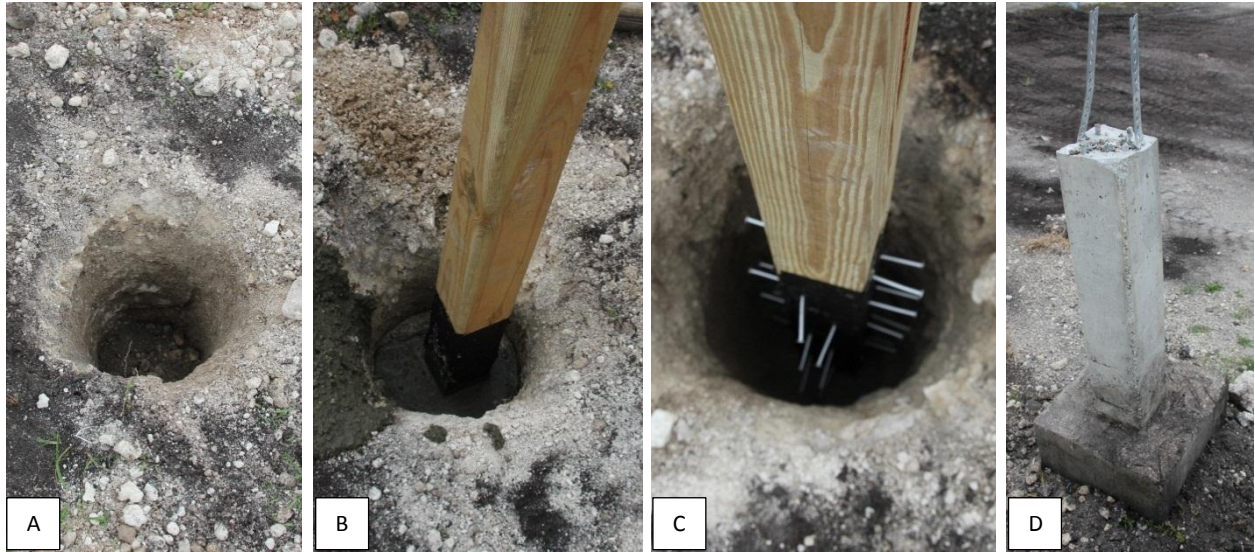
(A) Auger-perforated hole, (B) 4-inx4in timber embedded in concrete, (C) 4-inx4-in timber with nails embedded in concrete and (D) precast concrete pier
